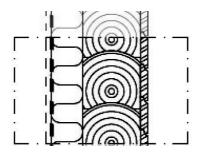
Structural section of external walls in log buildings. The structure consists of interior materials, which sometimes include layer of thermal insulation (approx. 50 mm), a load-bearing log frame (approx. 150 mm) and external surface material, which is usually timber (approx. 20-30 mm). This structure was widely used before the 1940s, but structures have been developed and log houses are still being built today (Weijo et al. 2019).
